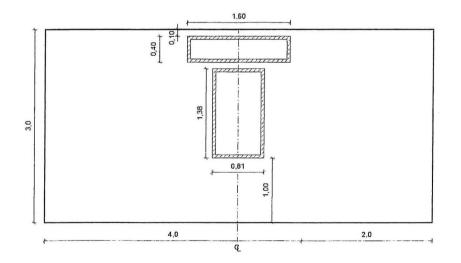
The bottom hung window is mounted in the insulated wall 10 cm below the ceiling. Another window is also mounted in the wall for other purposes.
